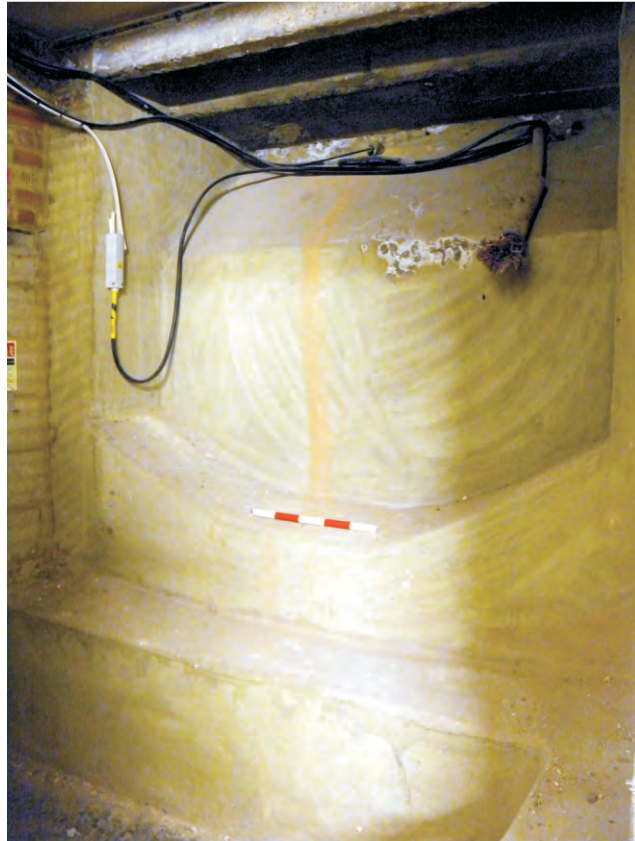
A blocked former basement window, Building 1, north perimeter, looking north
